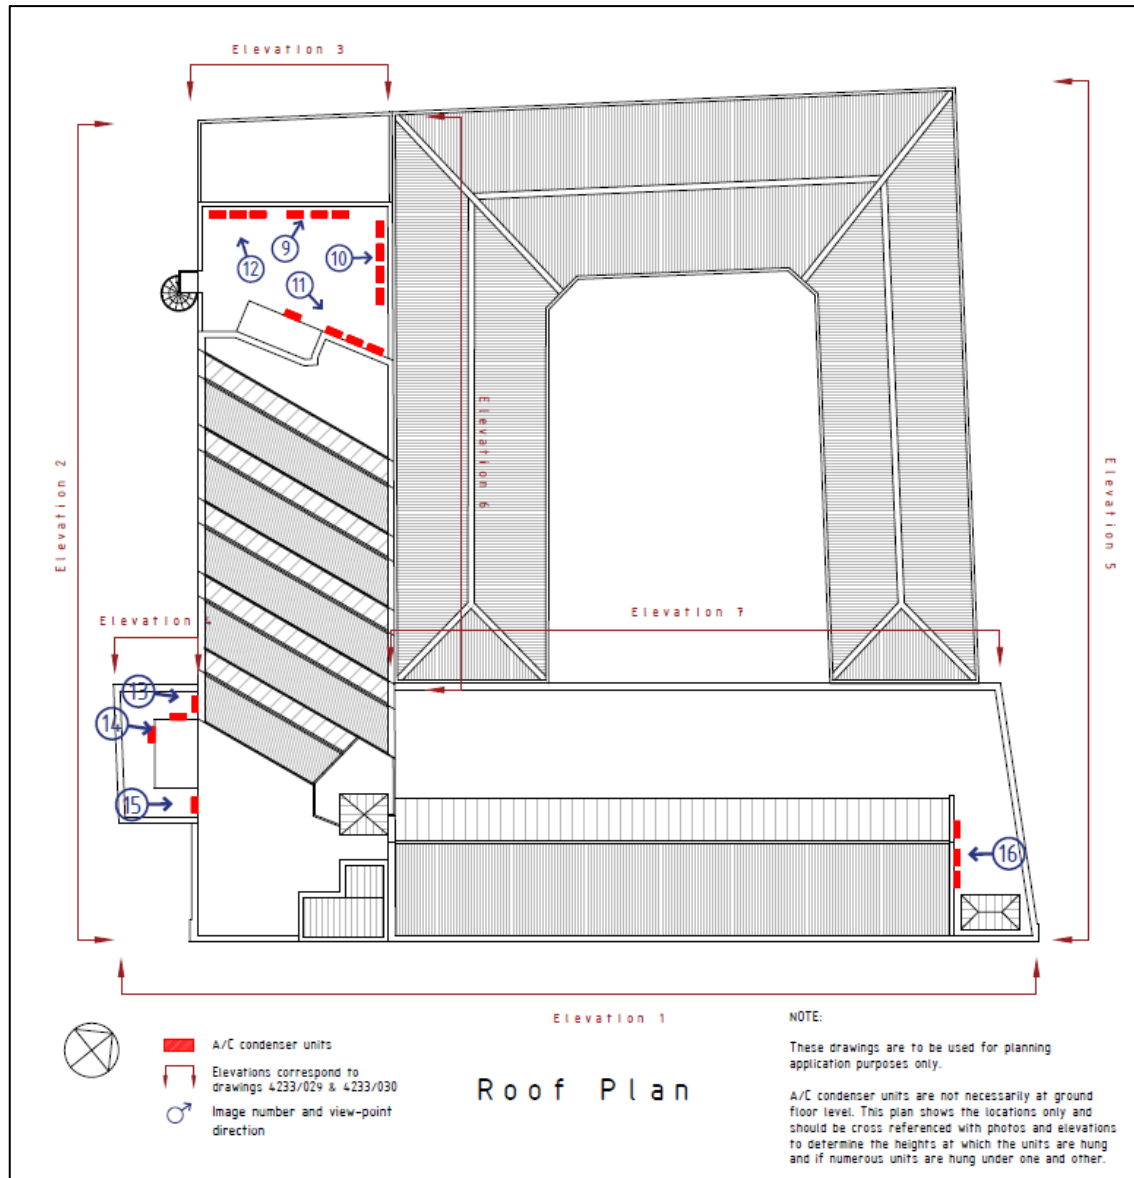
Location of Existing AHU – 2nd Floor/Roof
